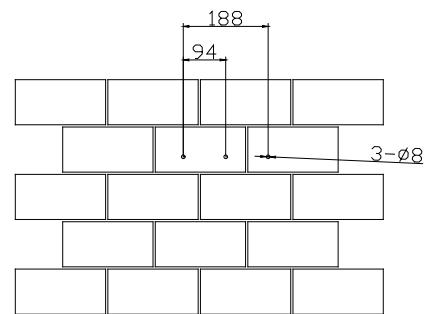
Drill hole dimensions of R5-0.7K/1K/1.5K/2K/2.5K/3K-S1
